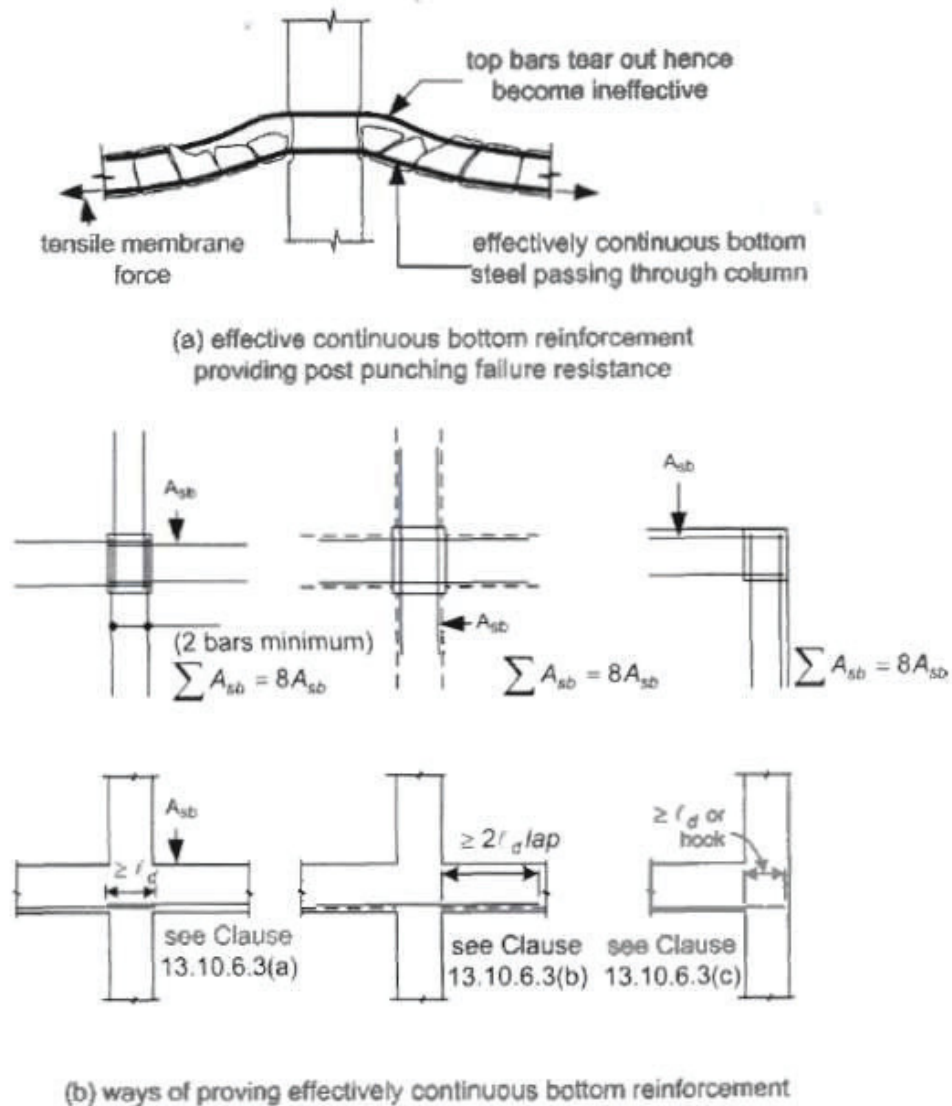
Detailing of reinforcement provided at the bottom of the slab at the location of column to serve as structural integrity reinforcement (CSA A23.3-04 Notes N13.10.8.6.1).
